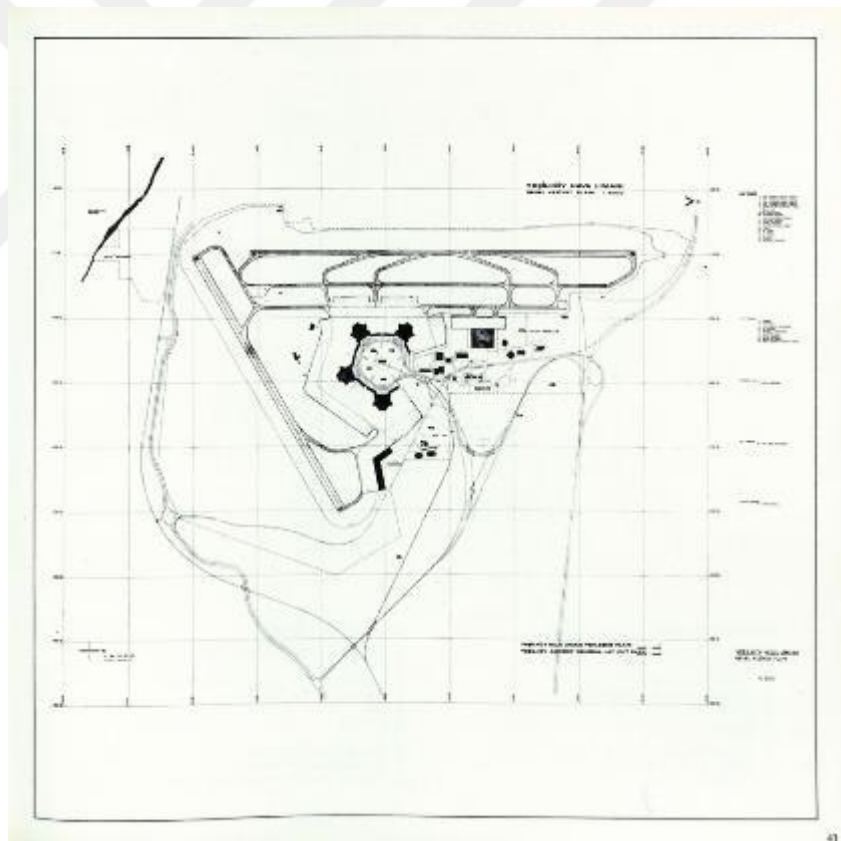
Airport General Layout Plan (Source: Salt Research Archives)
